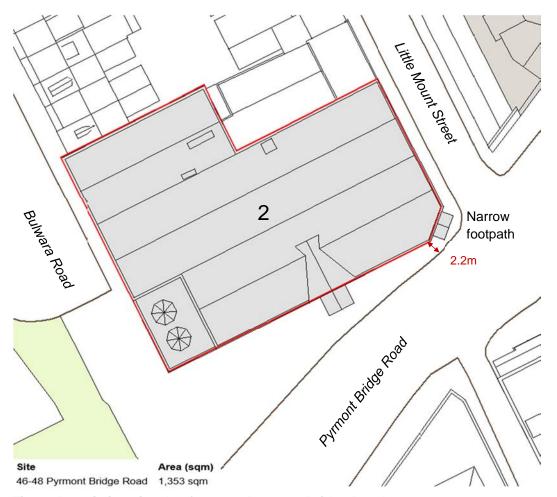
existing site plan for 46-48 Pyrmont Bridge Road
